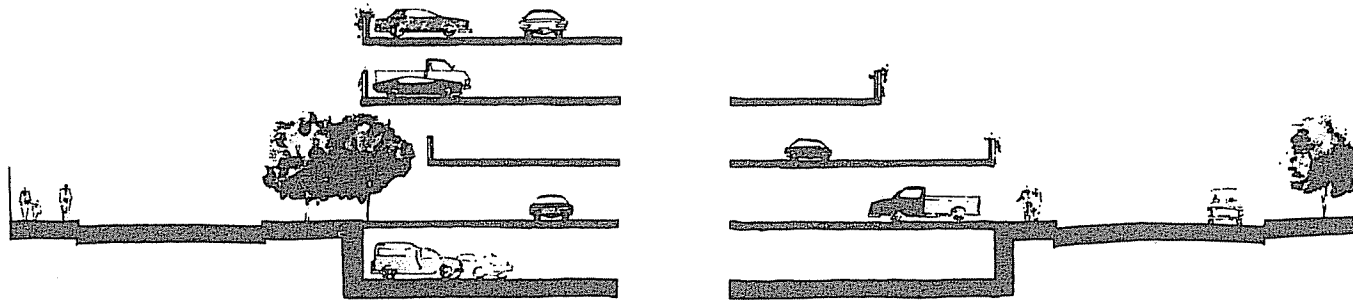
Conceptual longitudinal cross-section of north-south, half-block parking structure showing terraced north facade to admit more light to expanded pedestrian area
